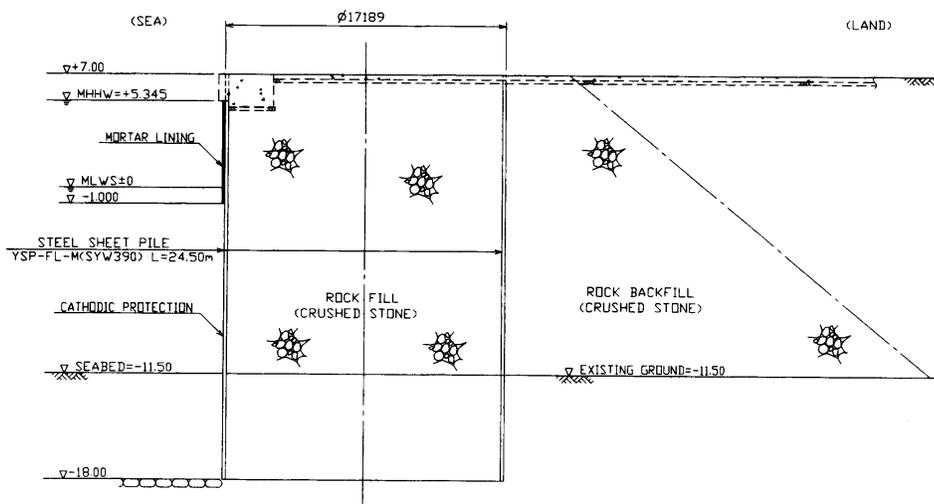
Typical Cross Section for Revetment Side
